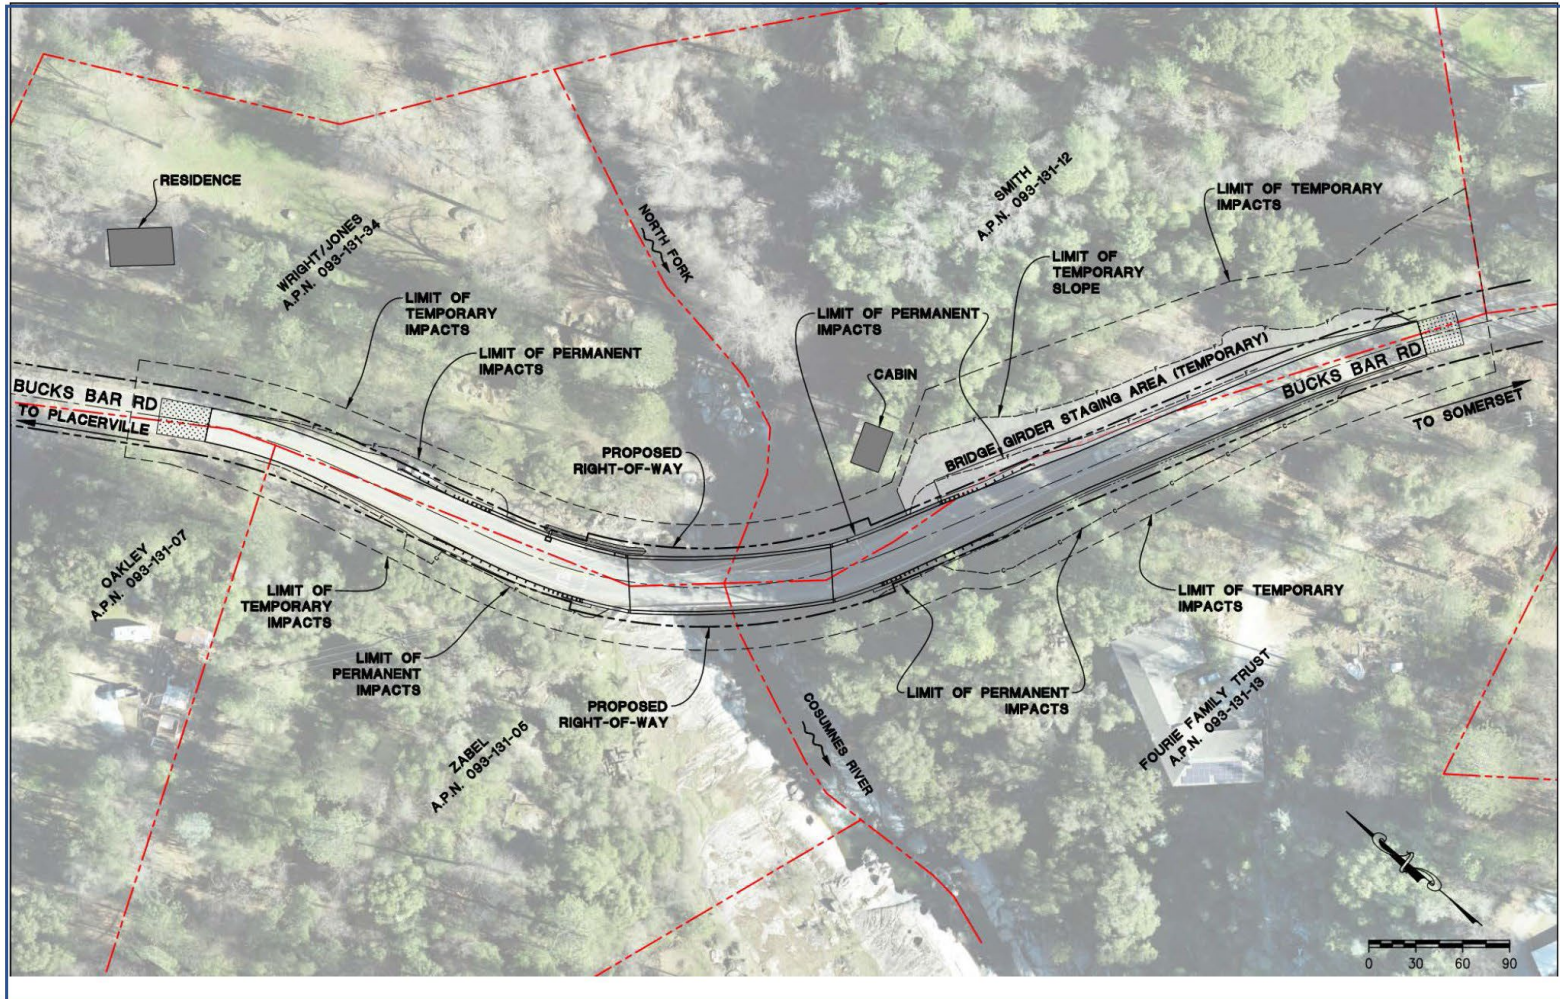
Plan View of Proposed Project on Bucks Bar Road
